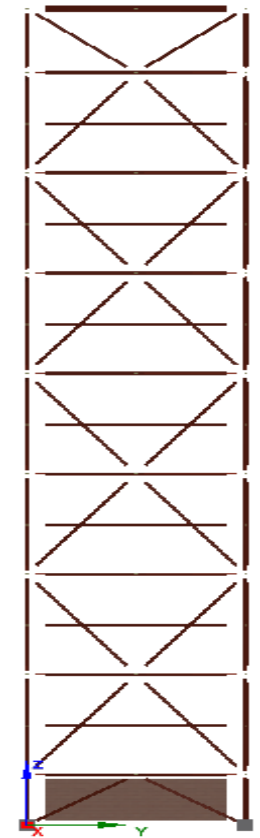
Side Elevation View (Axes A-B) of 15-Storey frame [12]
